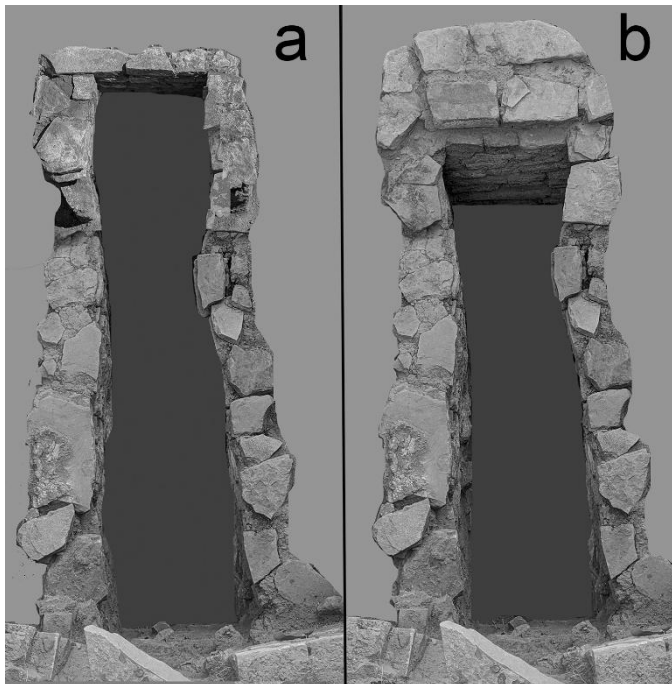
Kiva 32 ventilator tunnel. a) original configuration; b) north end filled with masonry.
